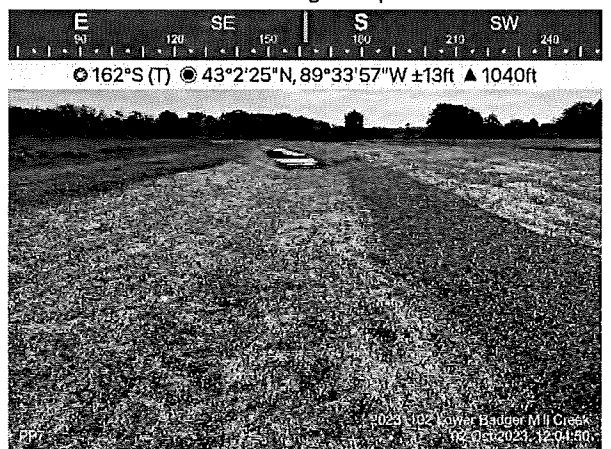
Photo point 7, view SSE along constructed swale for Lower Badger Mill Creek
